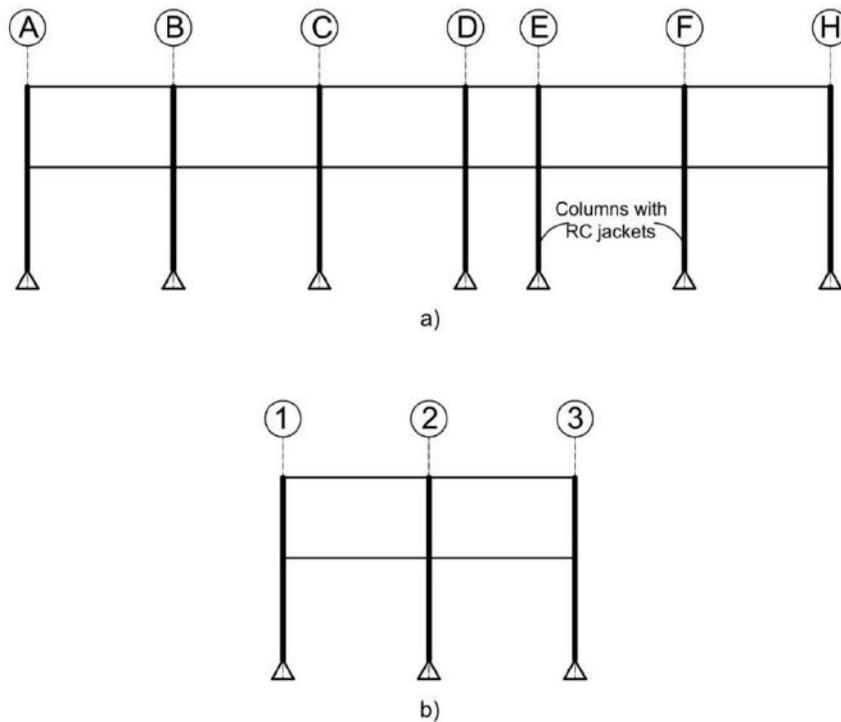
A 2-D numerical model of the retrofitted building (RS1): a) Frame 1 and b) Frame B.
